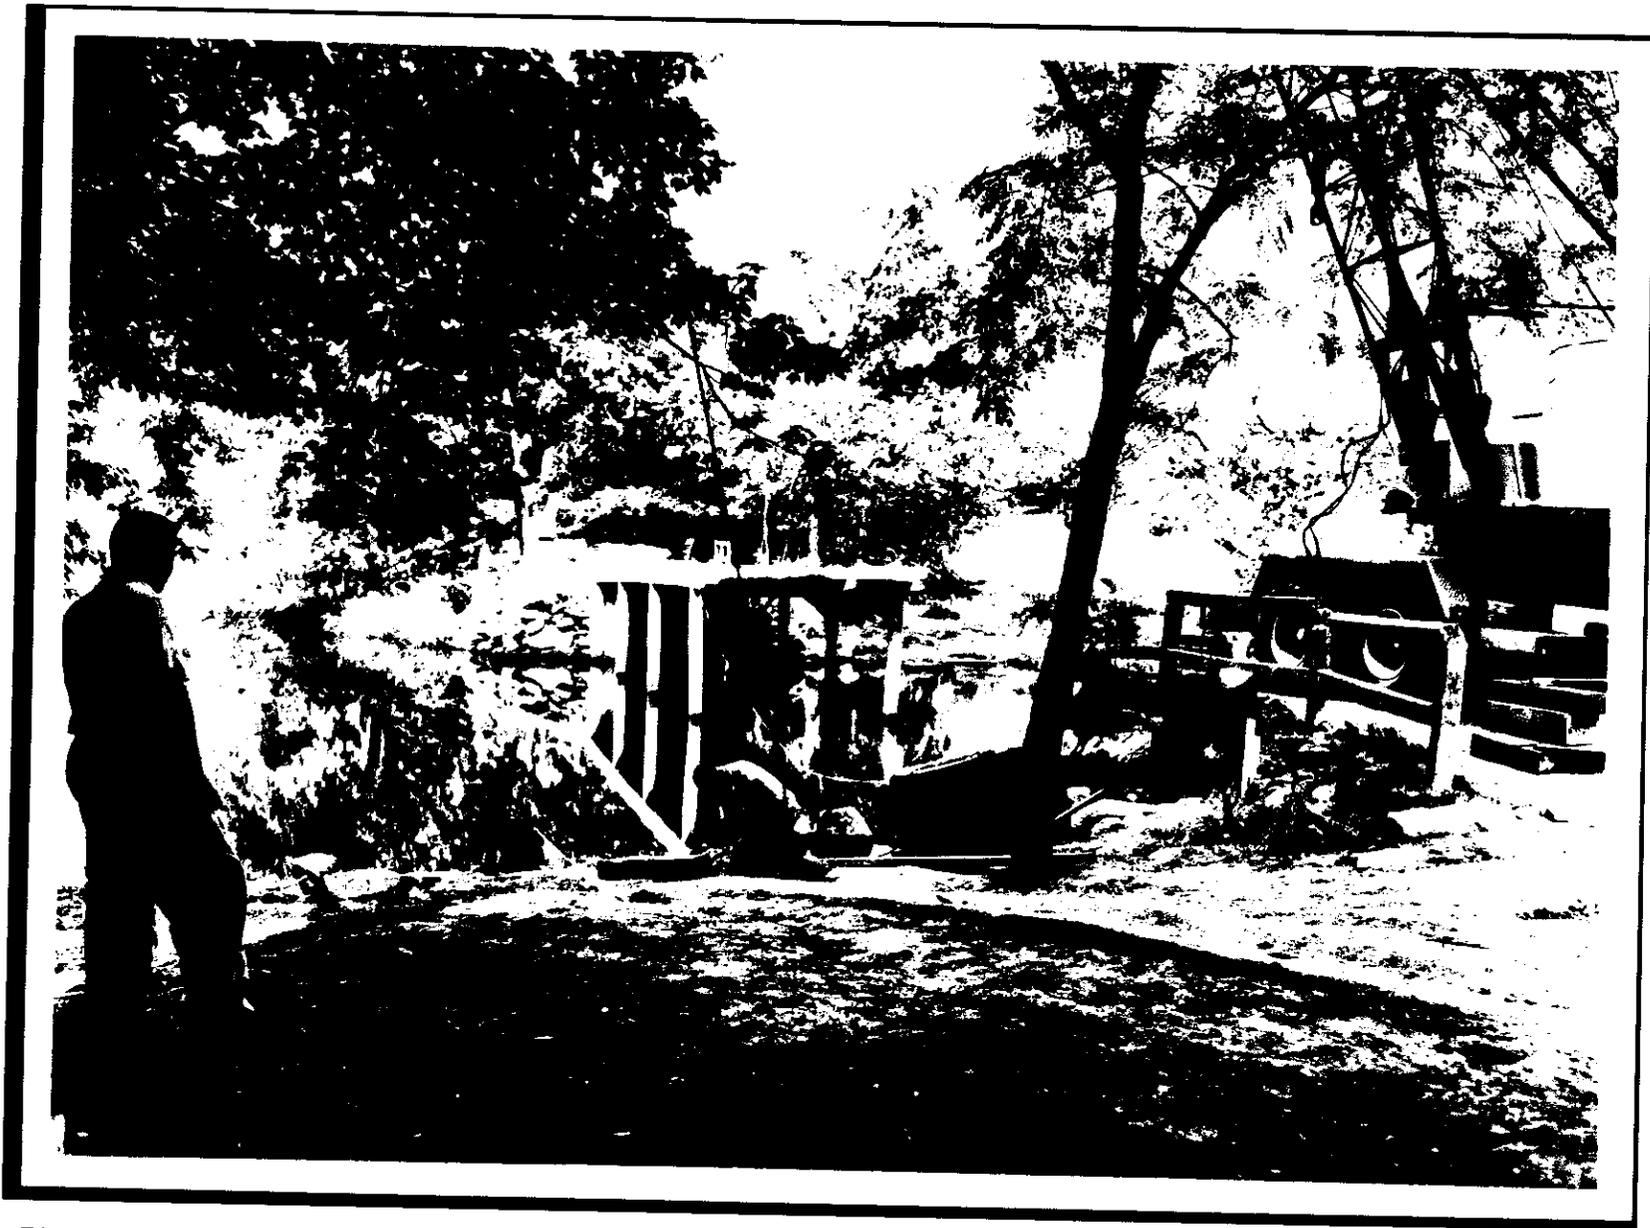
Old North Bridge, removing the 1909 concrete bridge in preparation for new construction, 1956. (Minute Man NHP Archive Collections, MIMA neg. # 337 16/15/4.3)
